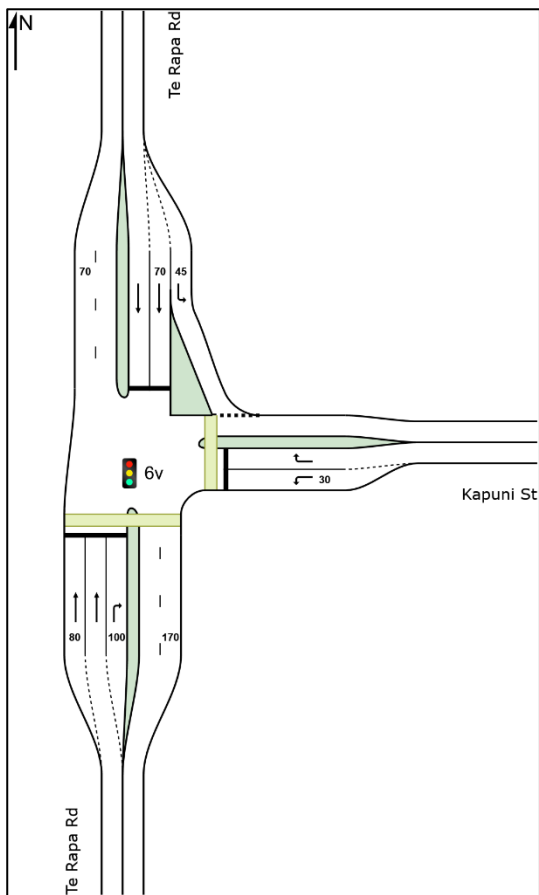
Proposed Te Rapa Rd / Kapuni St Signalised Intersection Layout
